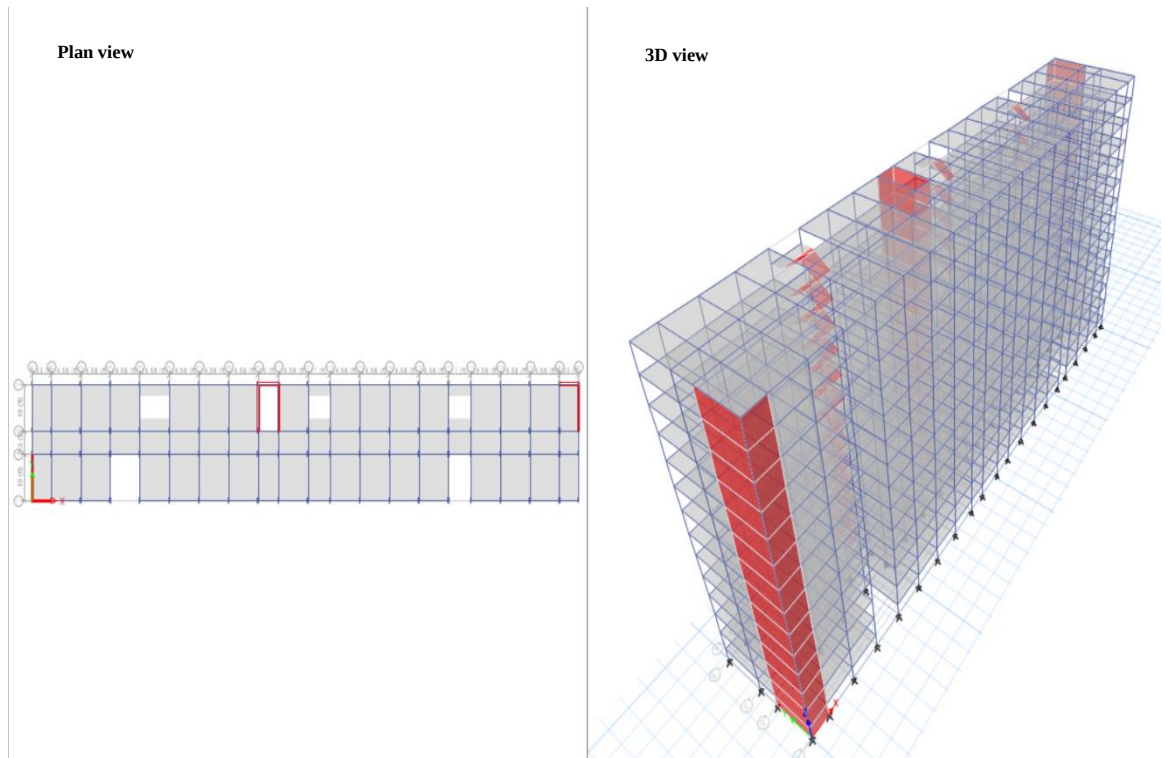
Case E (Building shear wall at two side diagonally upper right and lower left)
